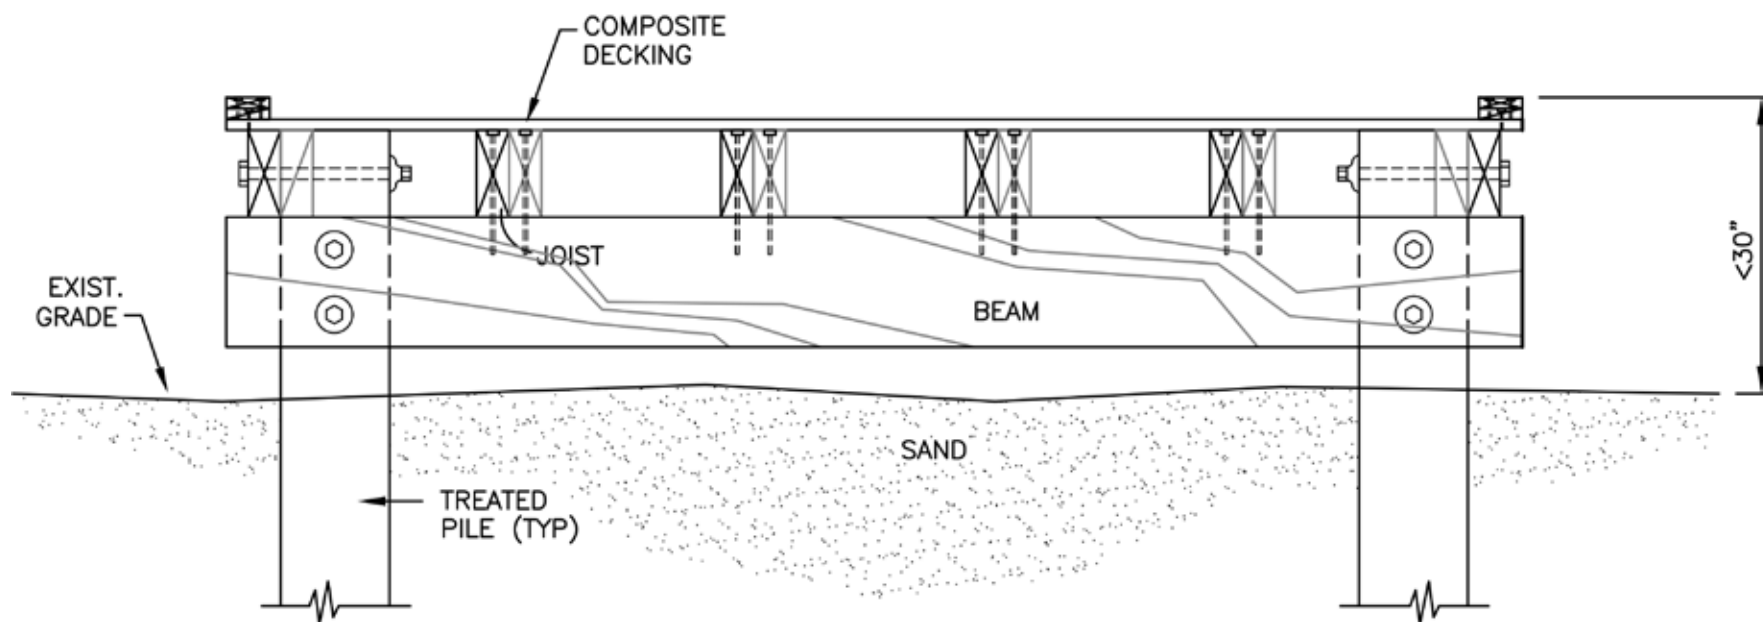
'-6" BILOXI SQUARE SIDEWALK
